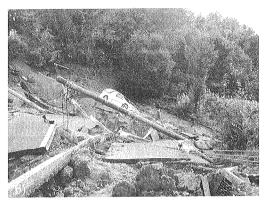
Collapse of an embankment for regional road around newly-developed building estates (at Taka-machi 4-chome, Nagaoka city; site 7 in Figure 1)
